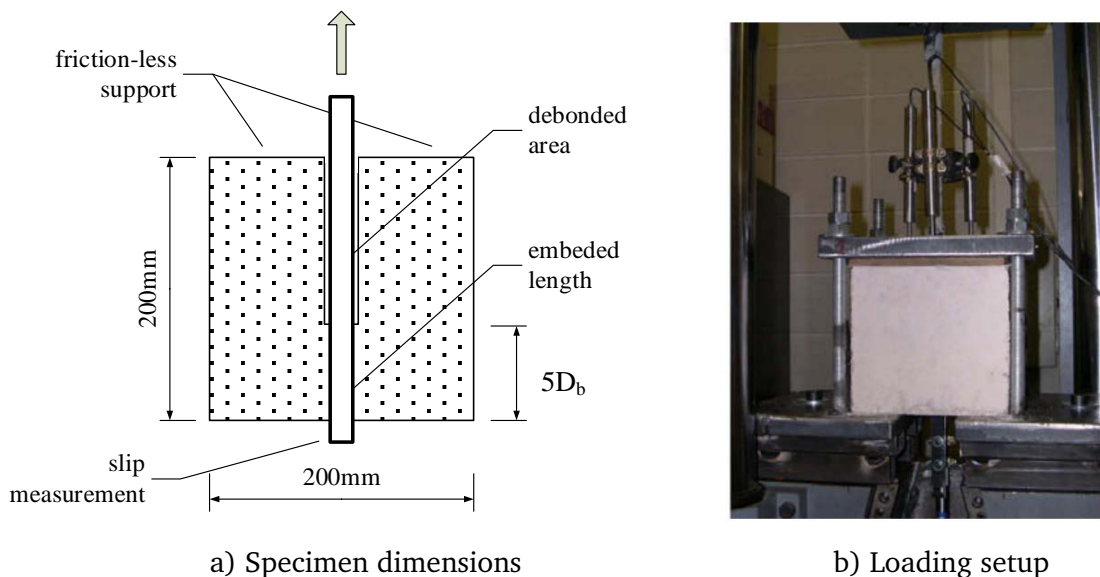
Pull-out test specimen and setup (after Baena et al. 2009)
